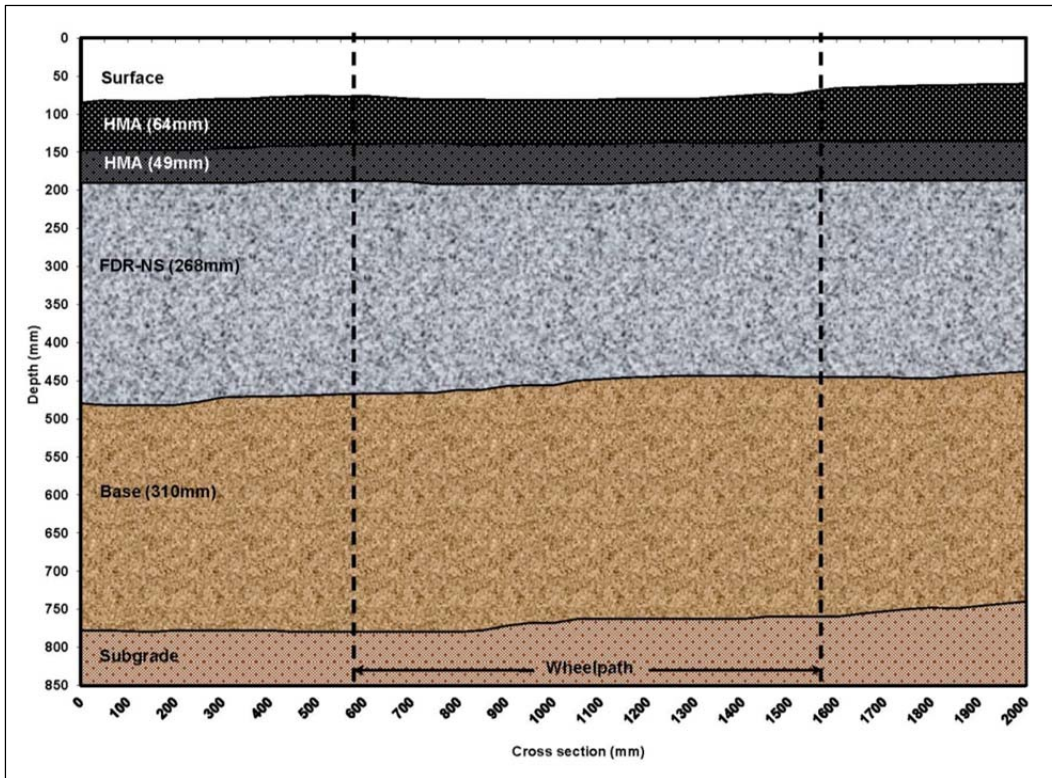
684HB: FDR-NS (120 mm) test pit profile (after 590,000 load repetitions).
